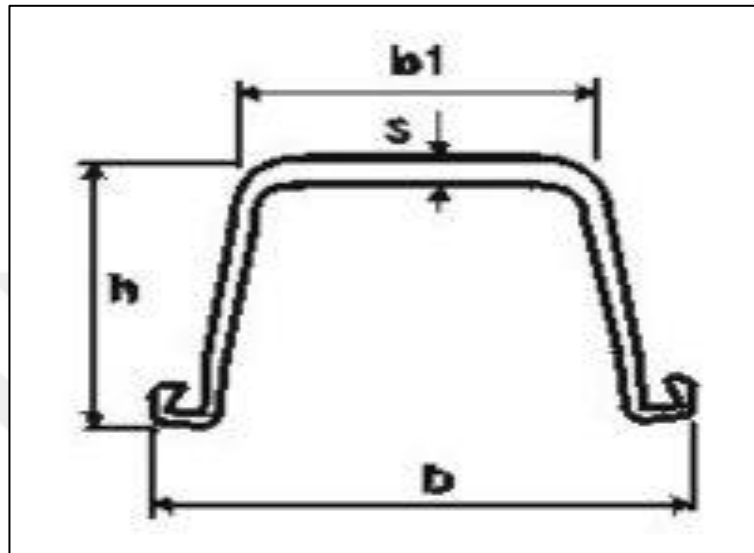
Cross Section of Larassan Sheet Piles.[21]
